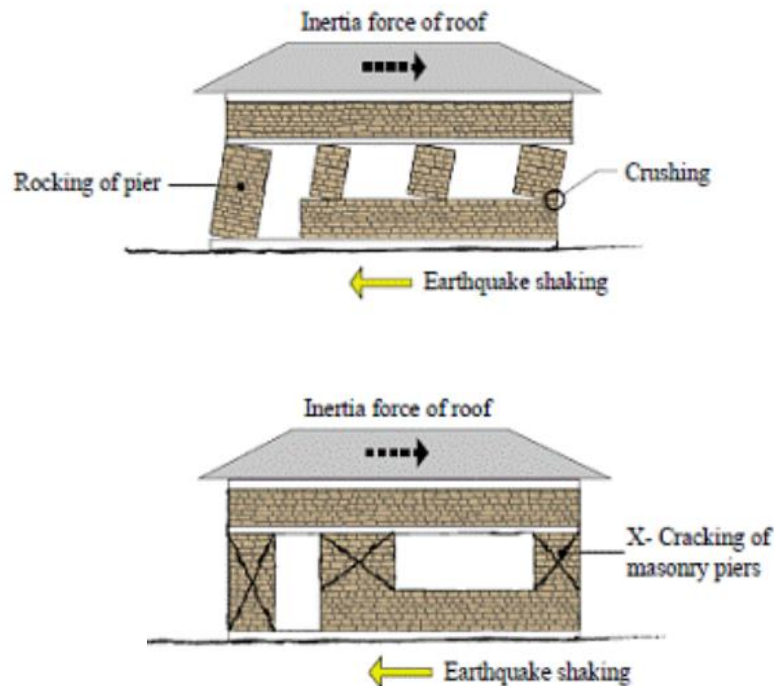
In-plane damage of stone masonry walls: on top rocking failure, and on the bottom diagonal shear cracking (adapted from: Murty 2005)
